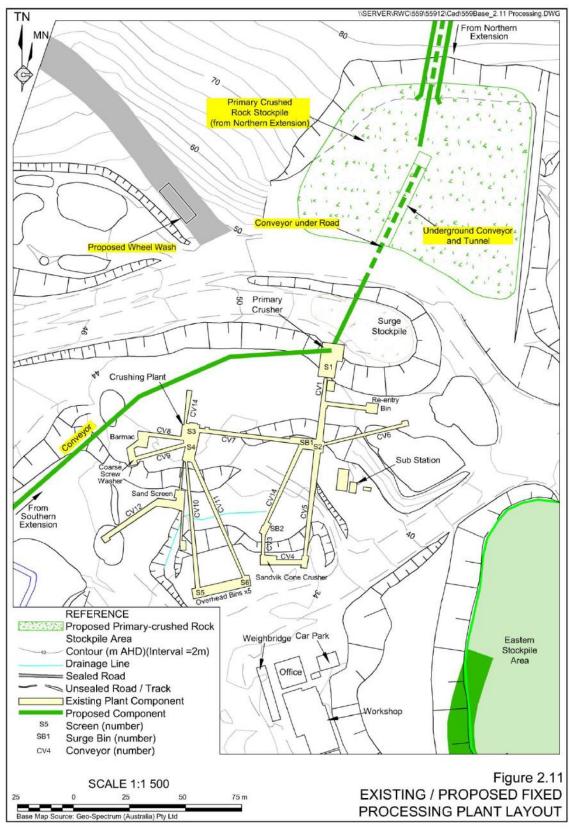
Existing / Proposed Fixed Processing Plant Layout
